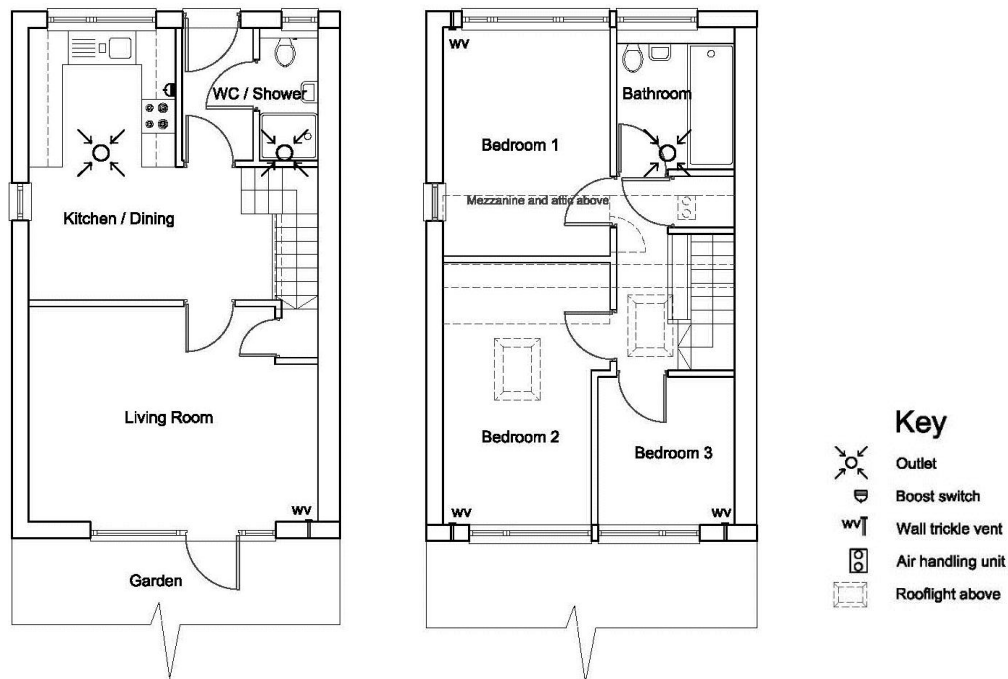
Typical 3-bed unit at Case A (scale 1:150, ground floor left, first floor right, orientation varies across site (see Figure 32))
